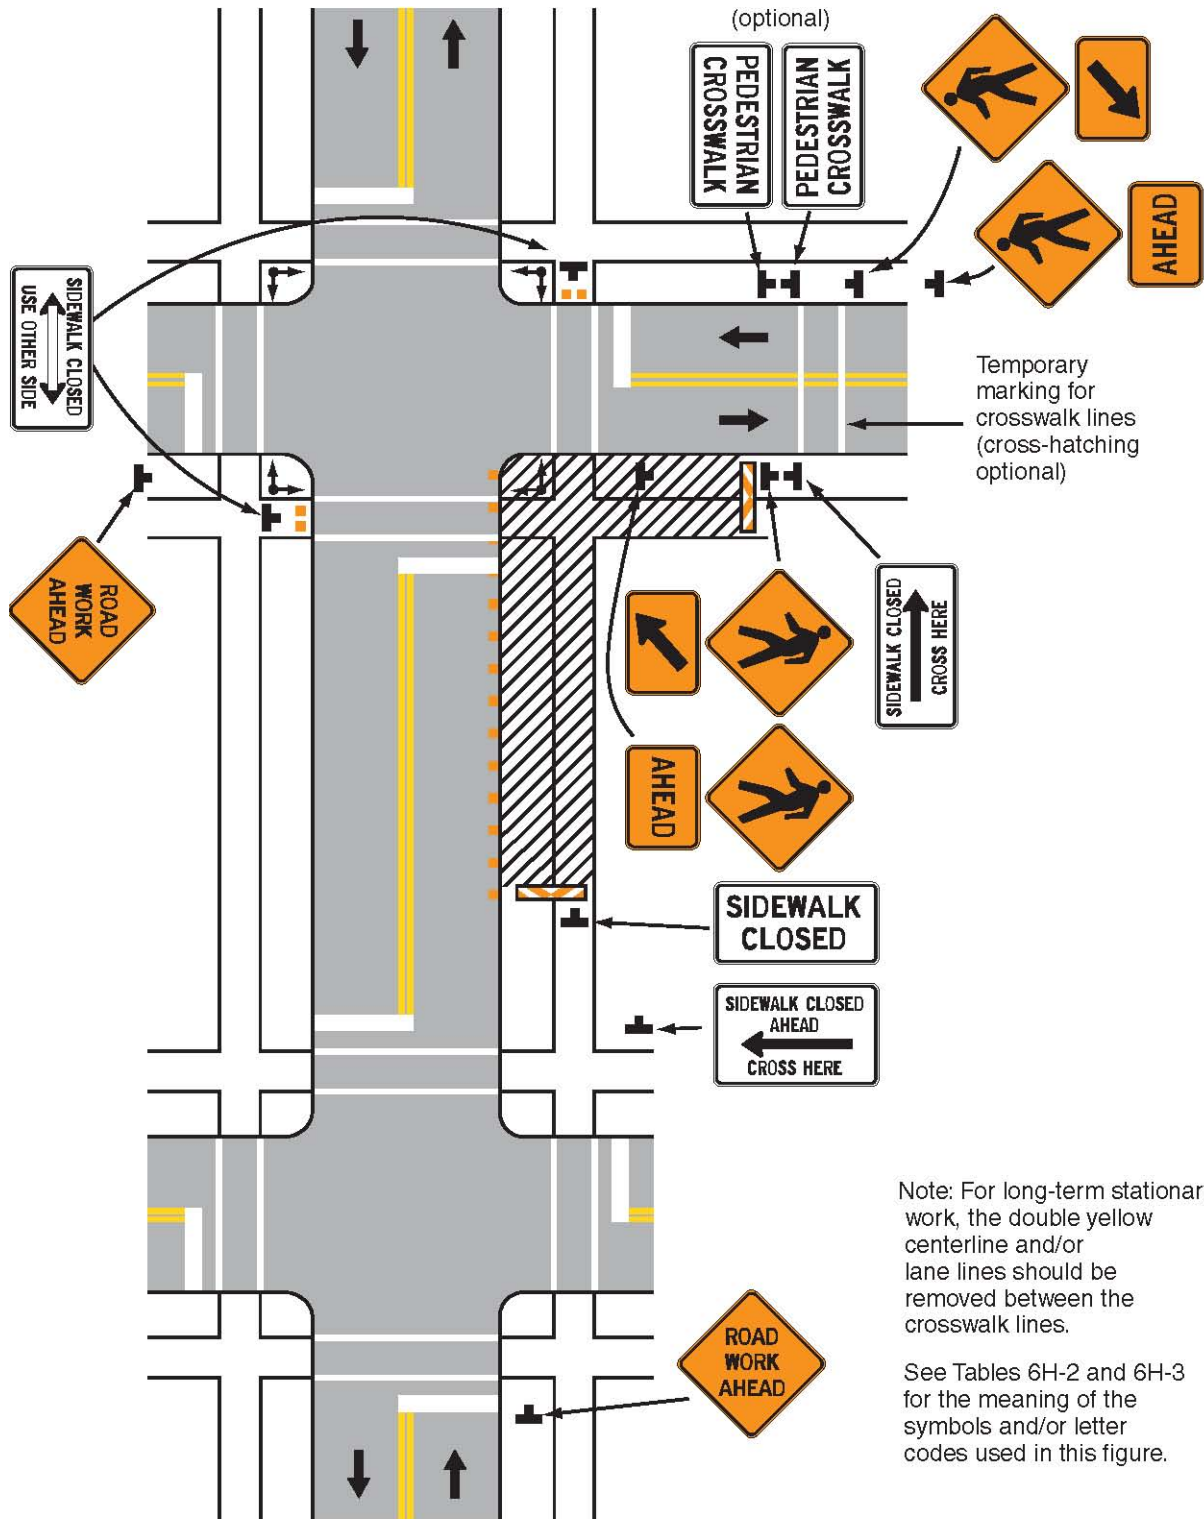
H-28. Sidewalk Detour or Diversion (MI) (TA-28)
